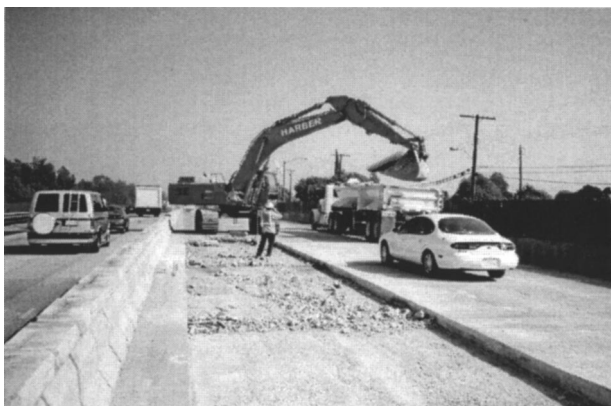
Nonimpact demolition of existing Portland cement concrete slab
